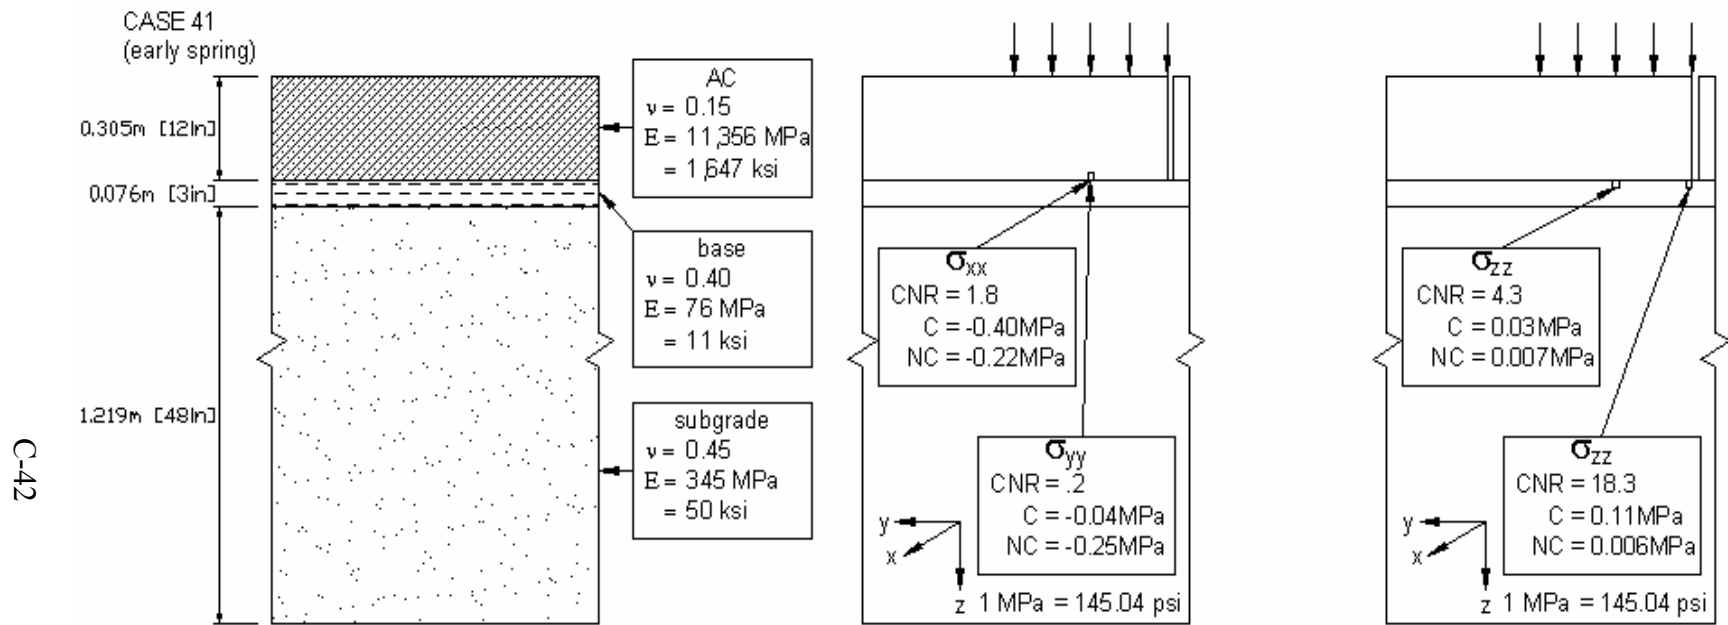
Summary cross section for case 41, (C – stress in cracked pavement, NC – stress in pavement with no crack, CNR – crack/no crack (stress) ratio)
